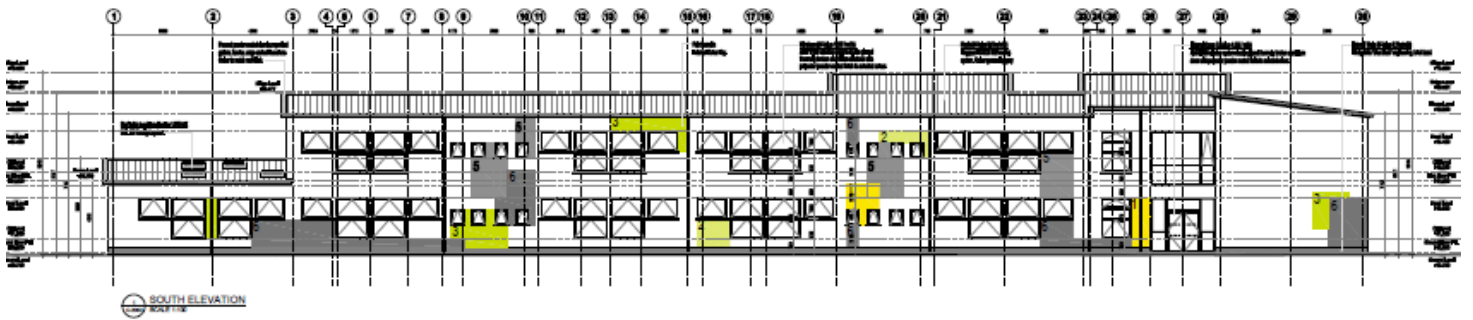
, 5, 6 & 7 – South, West, North & East Elevations
